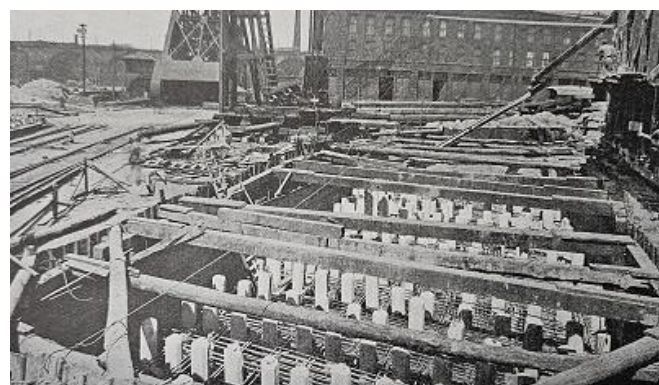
Square reinforced concrete piles driven for the Detroit-Superior Bridge, Cleveland, OH, mid-1910s. Source: Cahill (1923 B).
